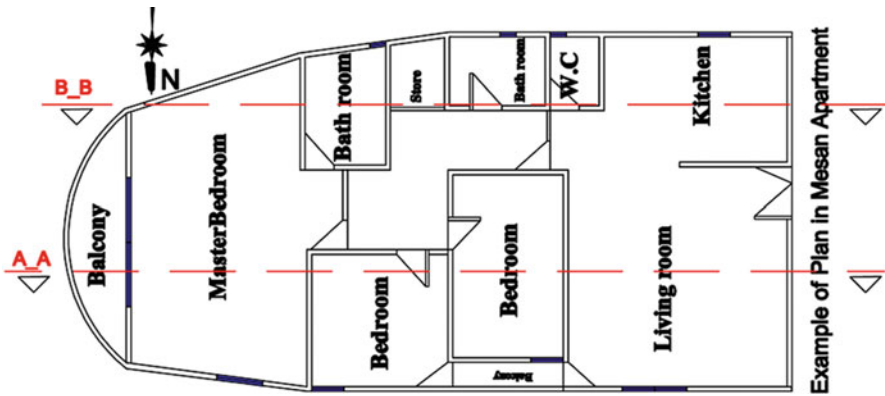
Plan in Mesan Apartment (drawn by author)
